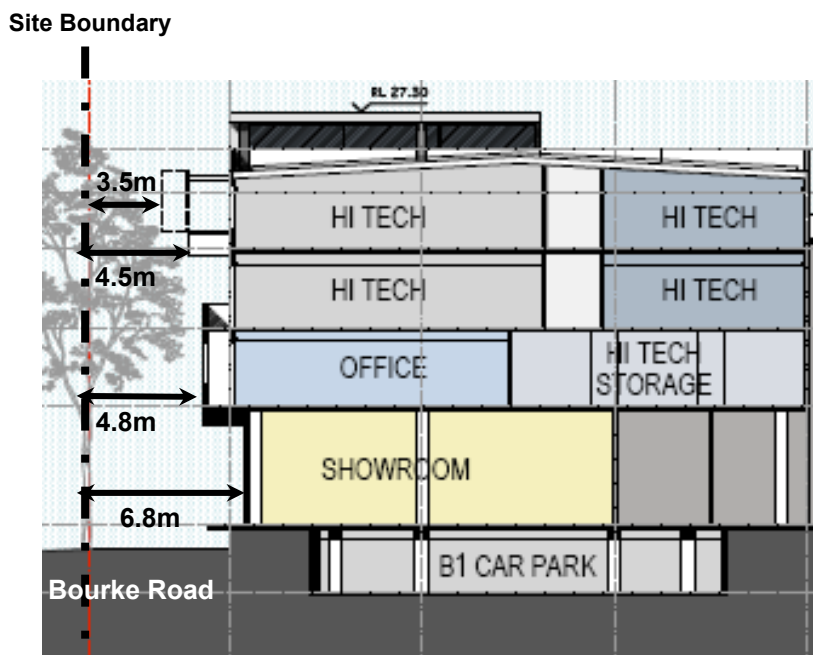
Cross section showing some of the stated setbacks at Bourke Road.
